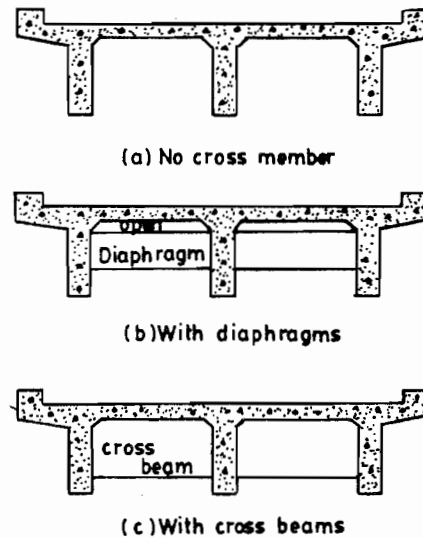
Typical Cross-section of T-Beam Bridges
